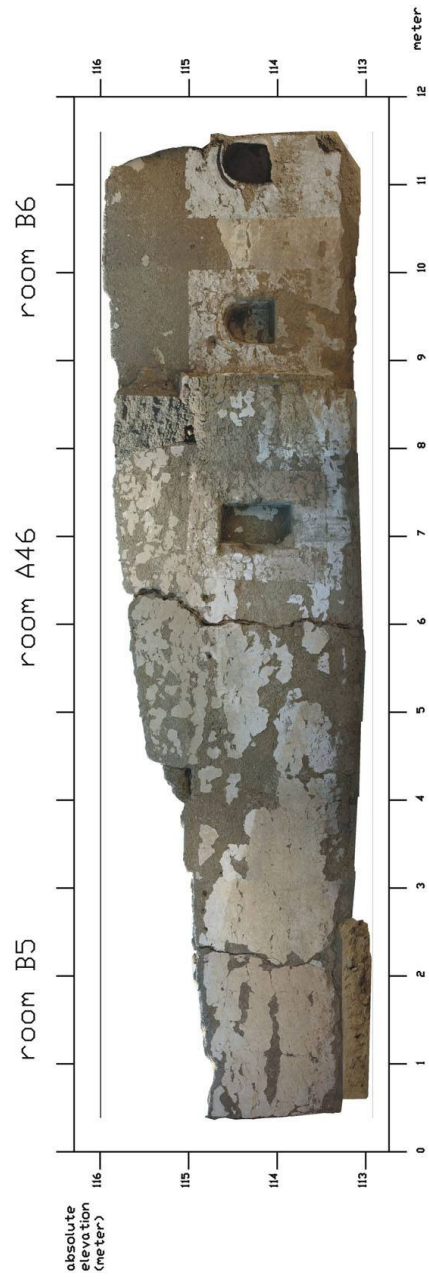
mosaic of photogrammetric images of the west walls of rooms B5, A46, and B6.
